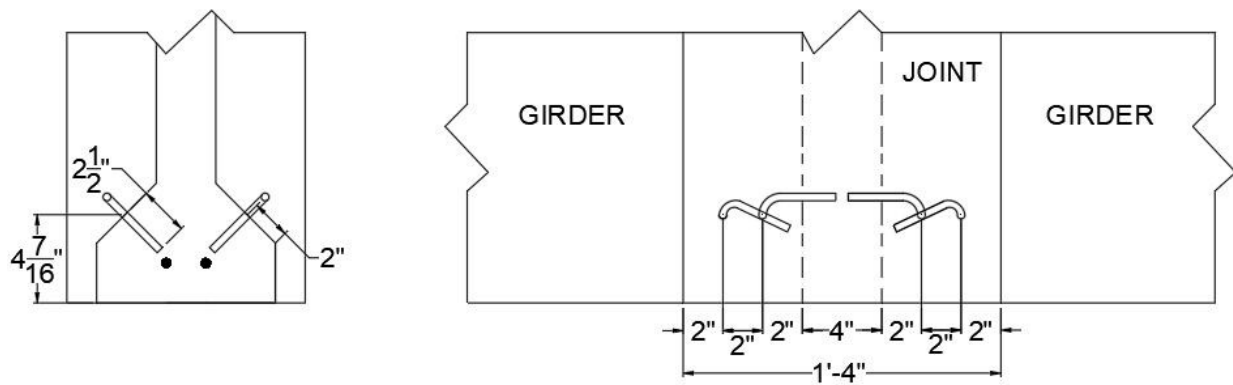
Retrofit continuity joint rebar shear studs detail for positive moment.
